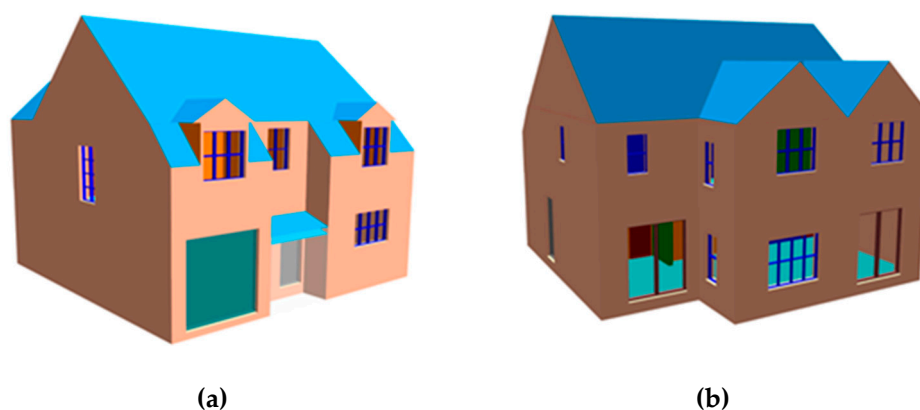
Schematic of the modelled building in TAS (a) Front elevation (b) Rear elevation.
